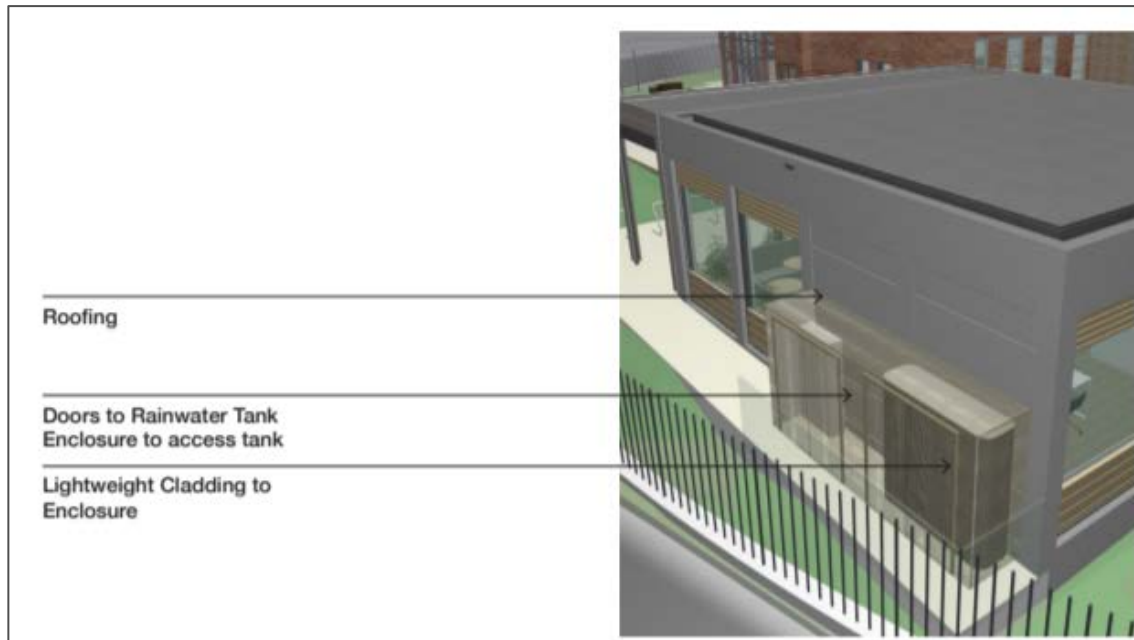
| Proposed treatment of rainwater tanks (Source: Modification report 2021)
